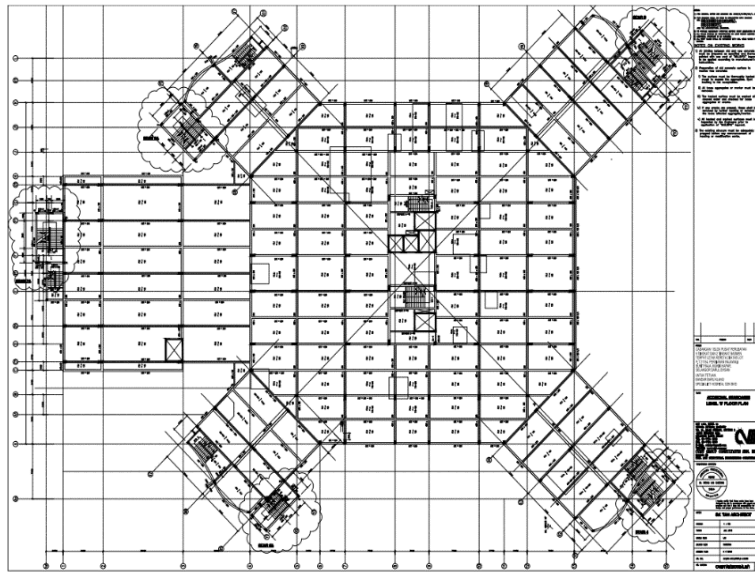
Structural Drawing of Ground Floor 5 of Storey Mid-Rise Building
